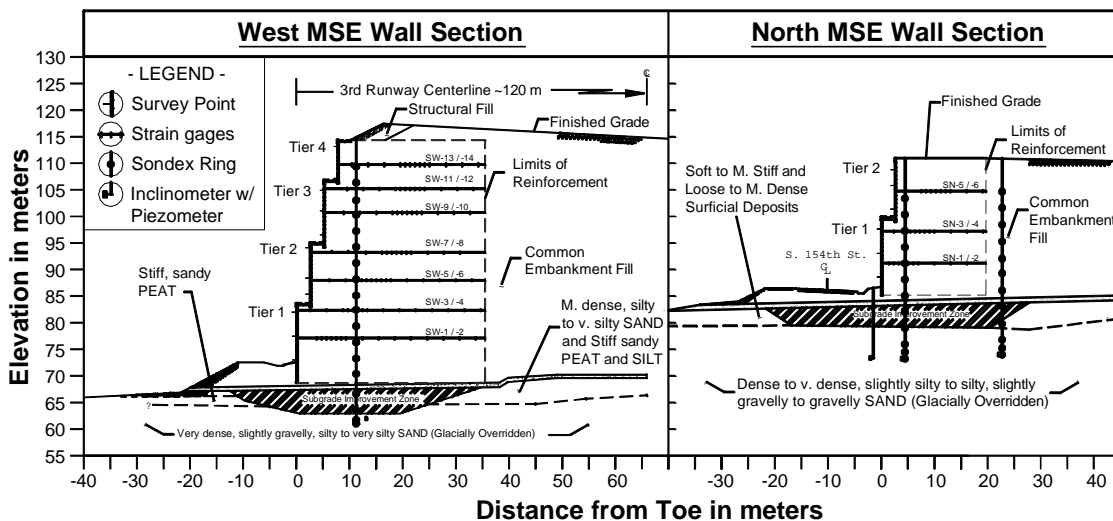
Sections of the (a) West and (b) North MSE walls showing the location of instrumentation (after Stuedlein et al. 2012).
